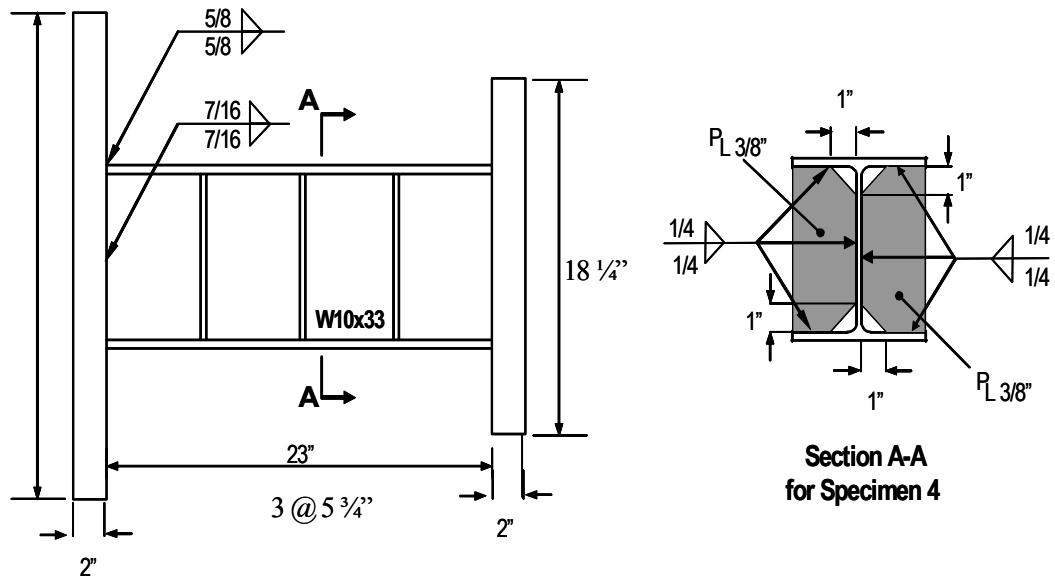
Welding and stiffener details for Specimen 4
